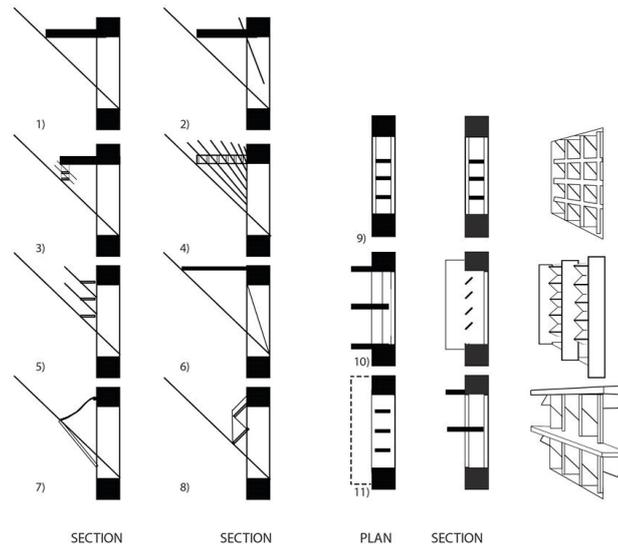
Orientation of the east and west of building to provide shading to openings in long walls
